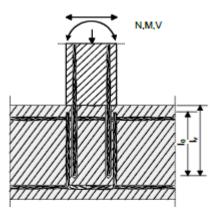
Overlap joint at a foundation of a column or wall where the rebar is stressed in tension
